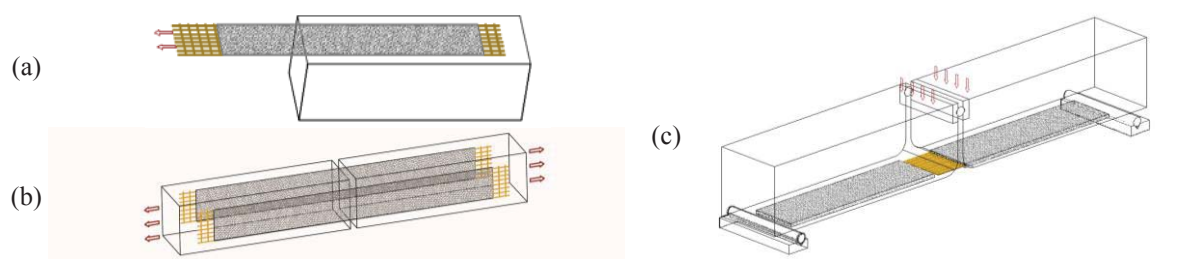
Typical test setup for (a) single-lap shear test, (b) double lap shear test, and (c) beam test.
